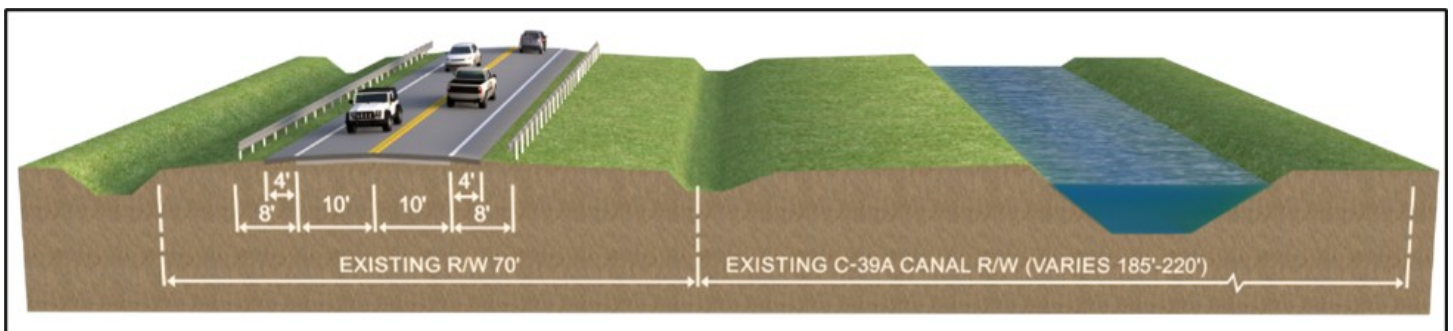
Existing S.R. 70 Typical Section from Harney Pond Canal C-41 to Indian Prairie Canal C-40
